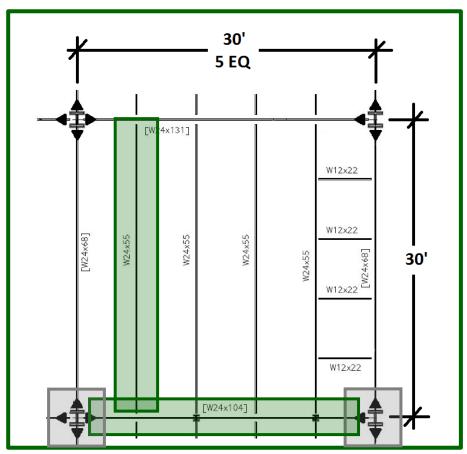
A framing plan of the third floor 30 foot by 30 foot bay all of the spot checks will be in. The green boxes show which beam and girder analyzed. The gray boxes show the two columns analyzed.
